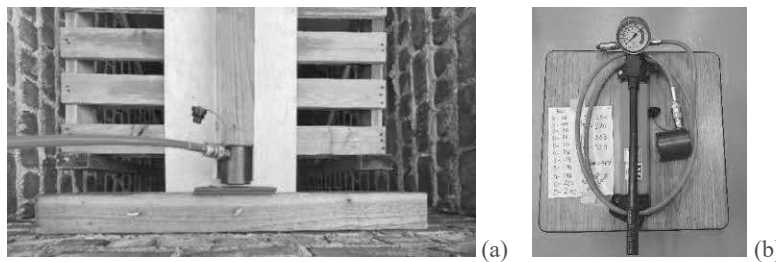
(a) Hydraulic jack placed inside the C-shaped wall (plan view), (b) Manual pump.
